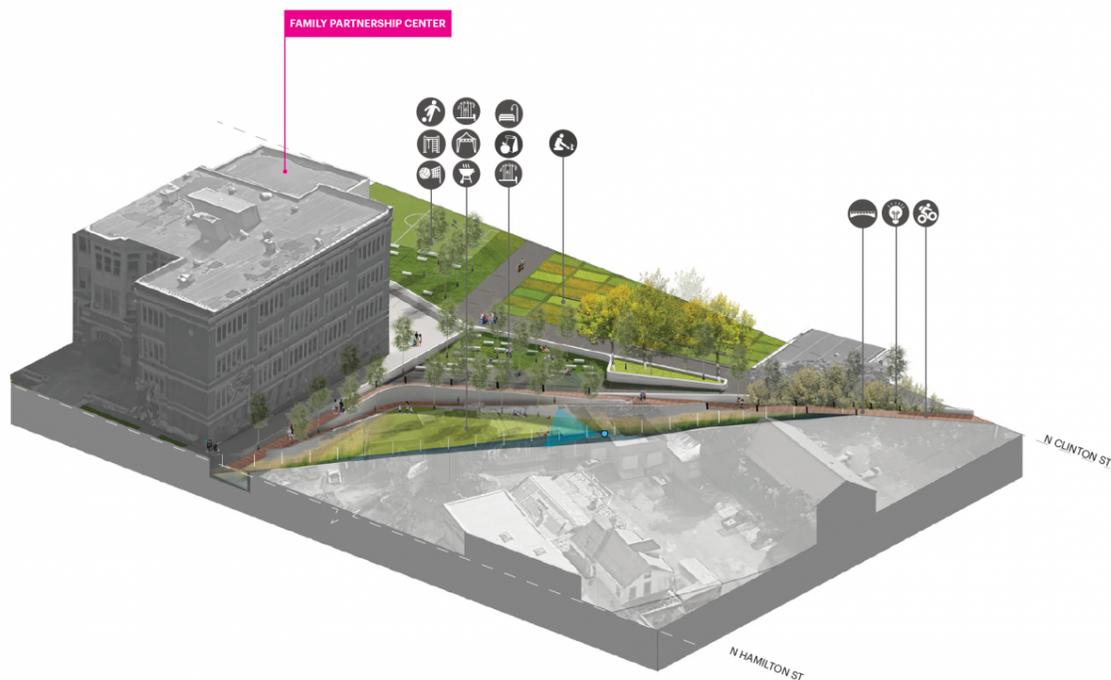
¹⁰⁶ Fall Kill Creek Site Plan, enlarged
